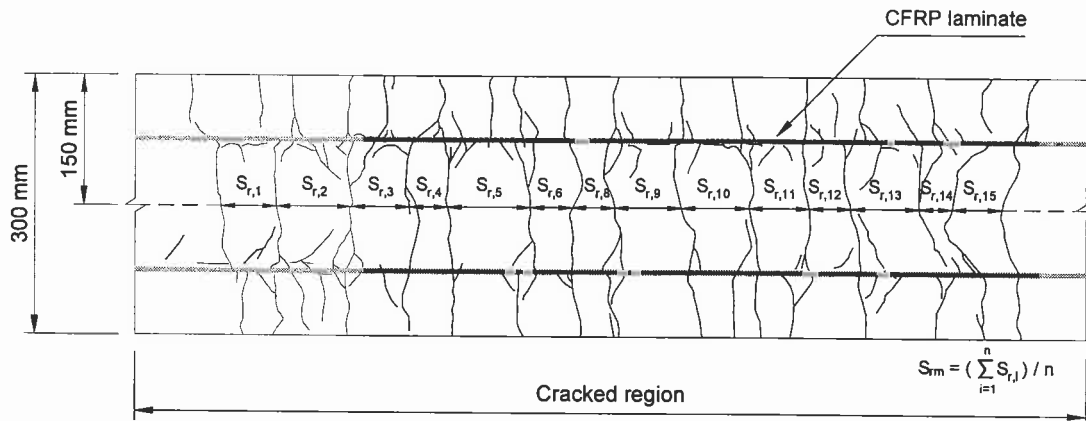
Determination of the average crack spacing (S_m) in the tested slab strips.
